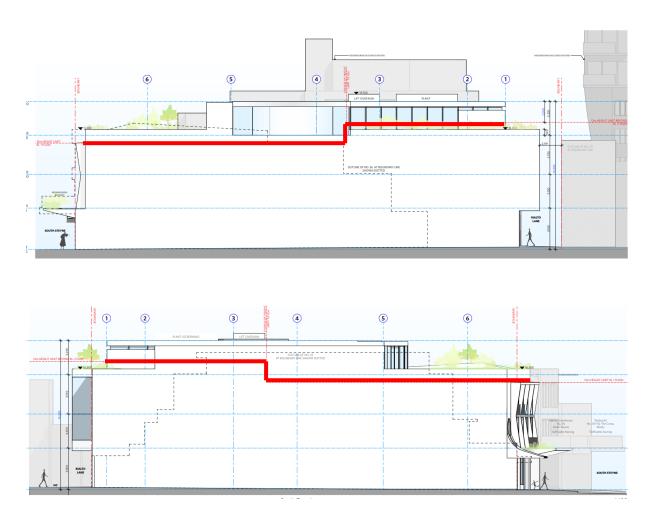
Elevation extracts showing the building height breaching elements on the 10 metre and 12 metre height limit affected portions of the site.
